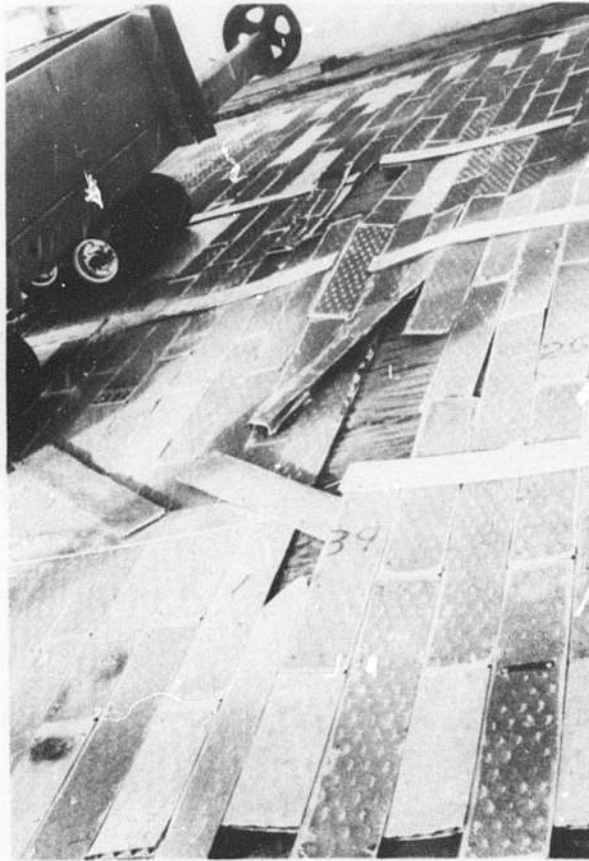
Close Up of Damaged Stiffened Mat Runway.
